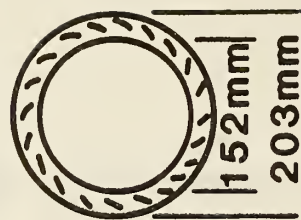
Commercial Chimney Section - Insulated Channel 25 mm - Combustibles 229 mm from Section
